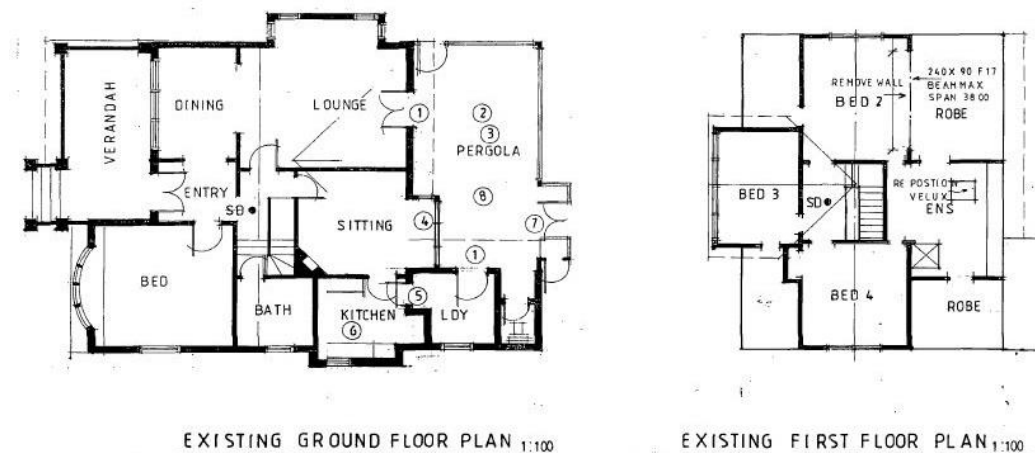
Floor plans as existing in 2001. Note the primary building outline corresponds to Figure 2, albeit the pergola now enclosing the whole of the rear of the building. Also note no door opening to Bed 3. (Source: BP 24990)
